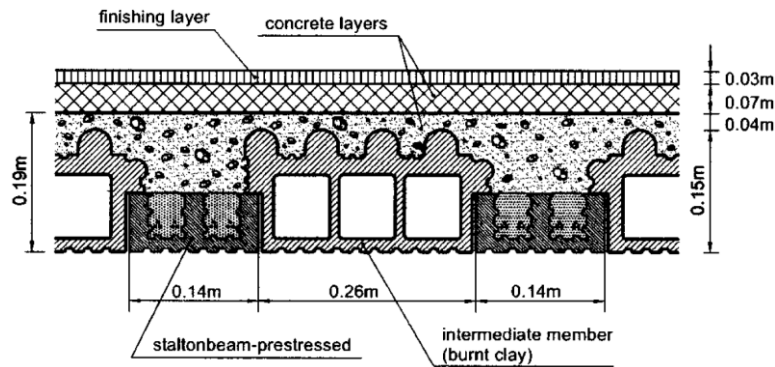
Cross section of the storey floors of verification project (3) (Degrande, Pyl, & Clouteau, 2004)
